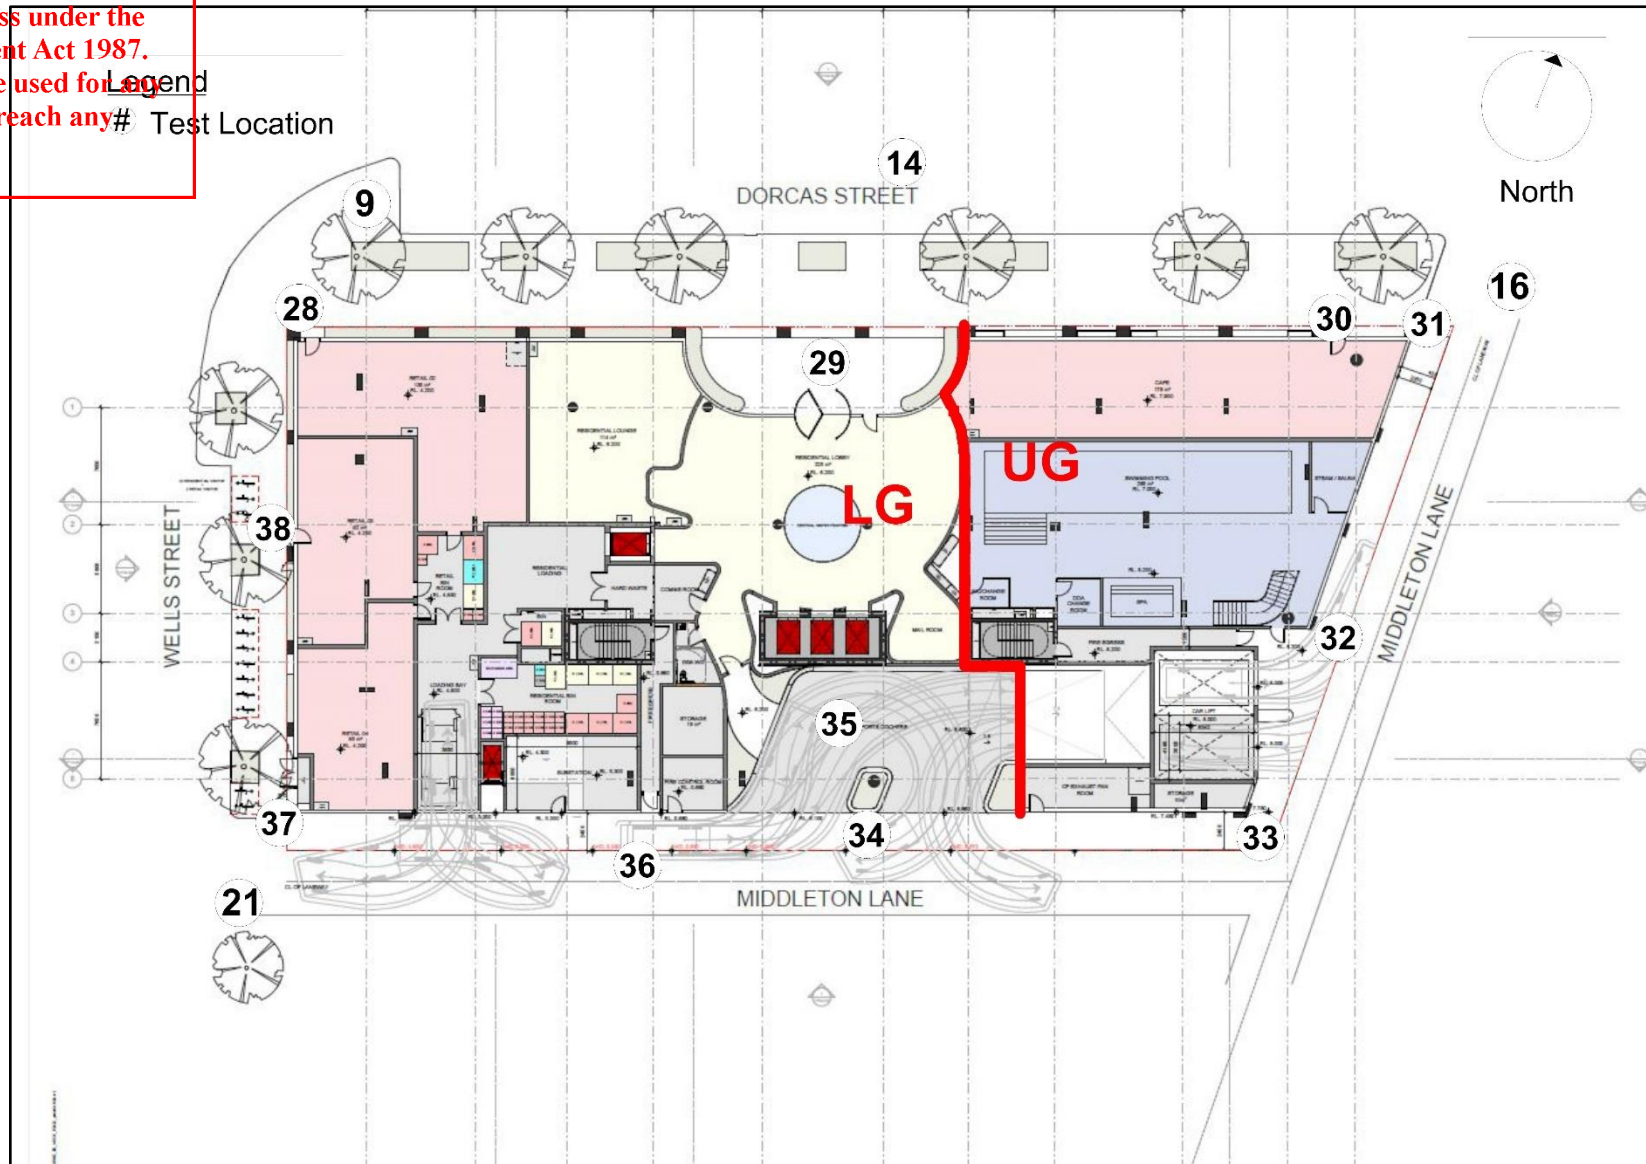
Test Locations on the building frontages for the proposed 11-27 Dorcas Street Development.
